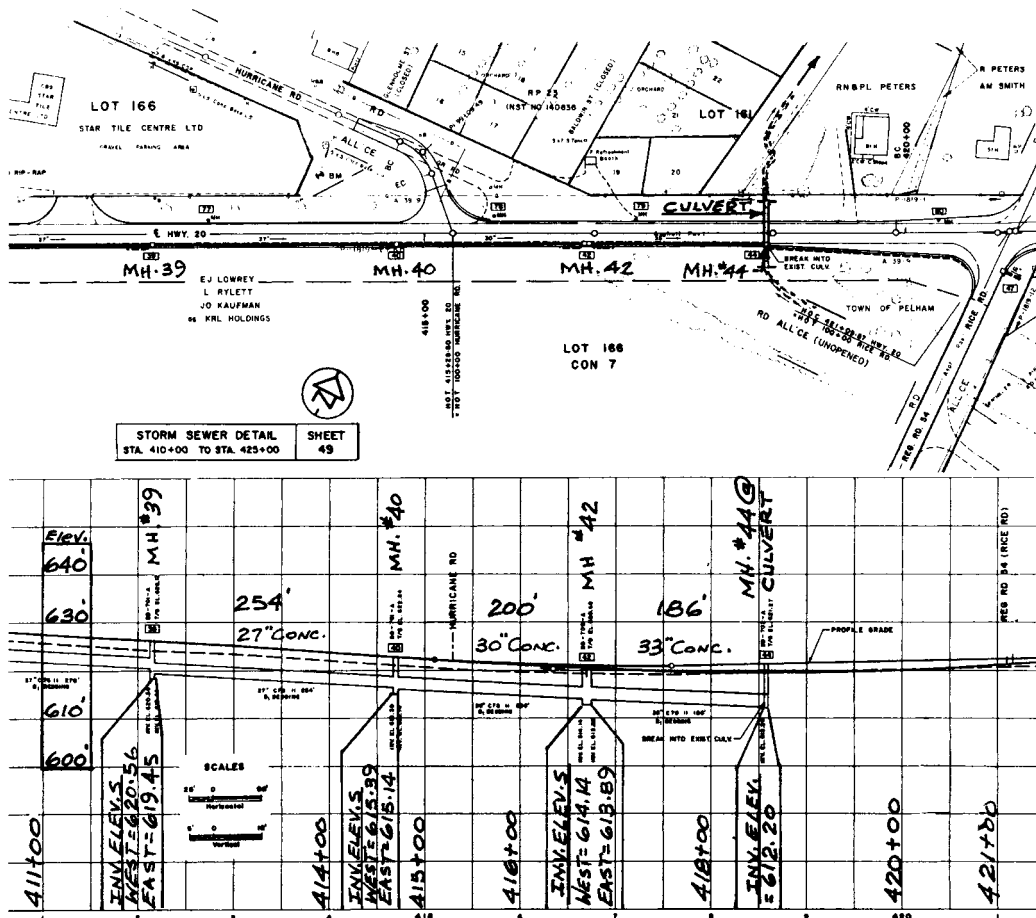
Plan and profile of Highway 20 (adapted)
